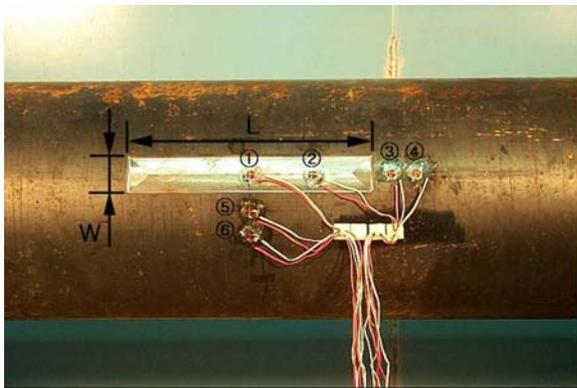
The shape of machined corrosion defect(300×50×0.5t)
